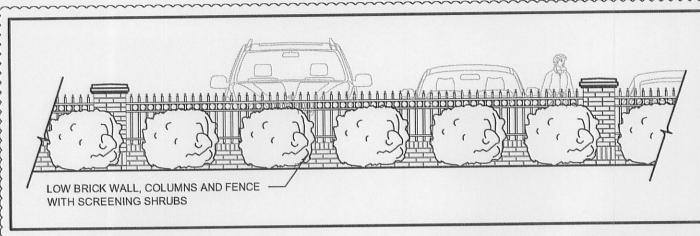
EXHIBIT B: W.T. HARRIS BLVD PROPOSED PARKING LOT SCREENING - ELEVATION (NOT TO SCALE)
